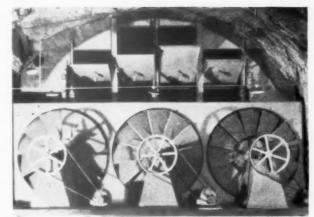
EXHAUST AIR FANS USED IN VENTILATING THE WAWONA TUNNEL.
